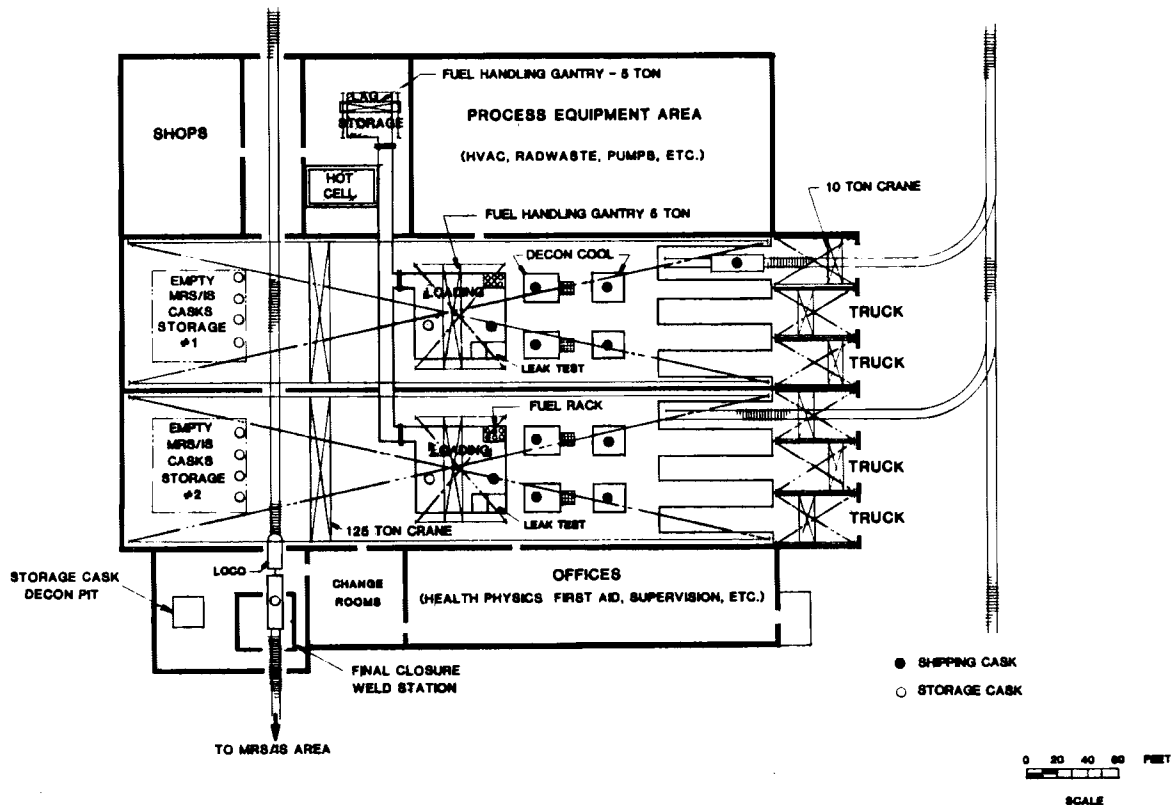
MRS/IS Facility Spent Fuel and High-Level Waste Handling Building Plan
